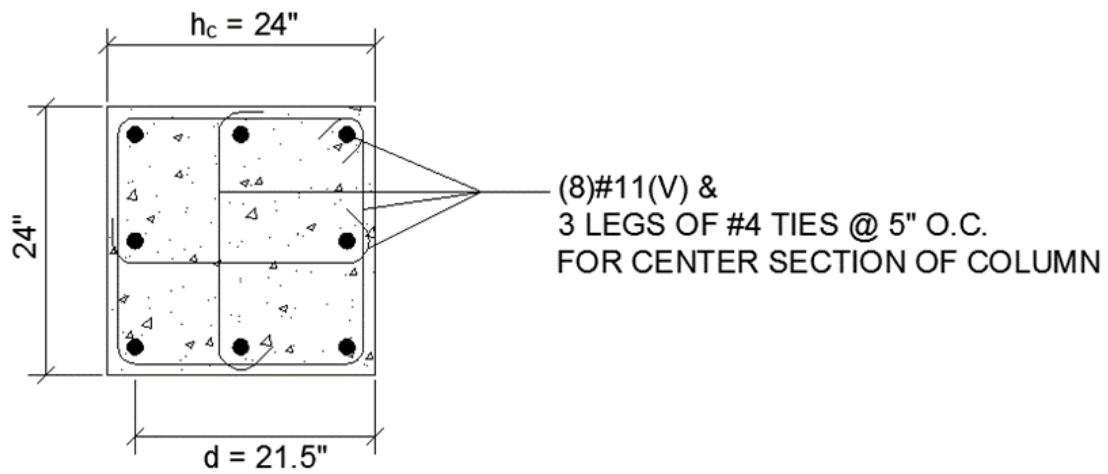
Exterior column, cross-section at center of column at ground floor level based on tsunami design requirements.
